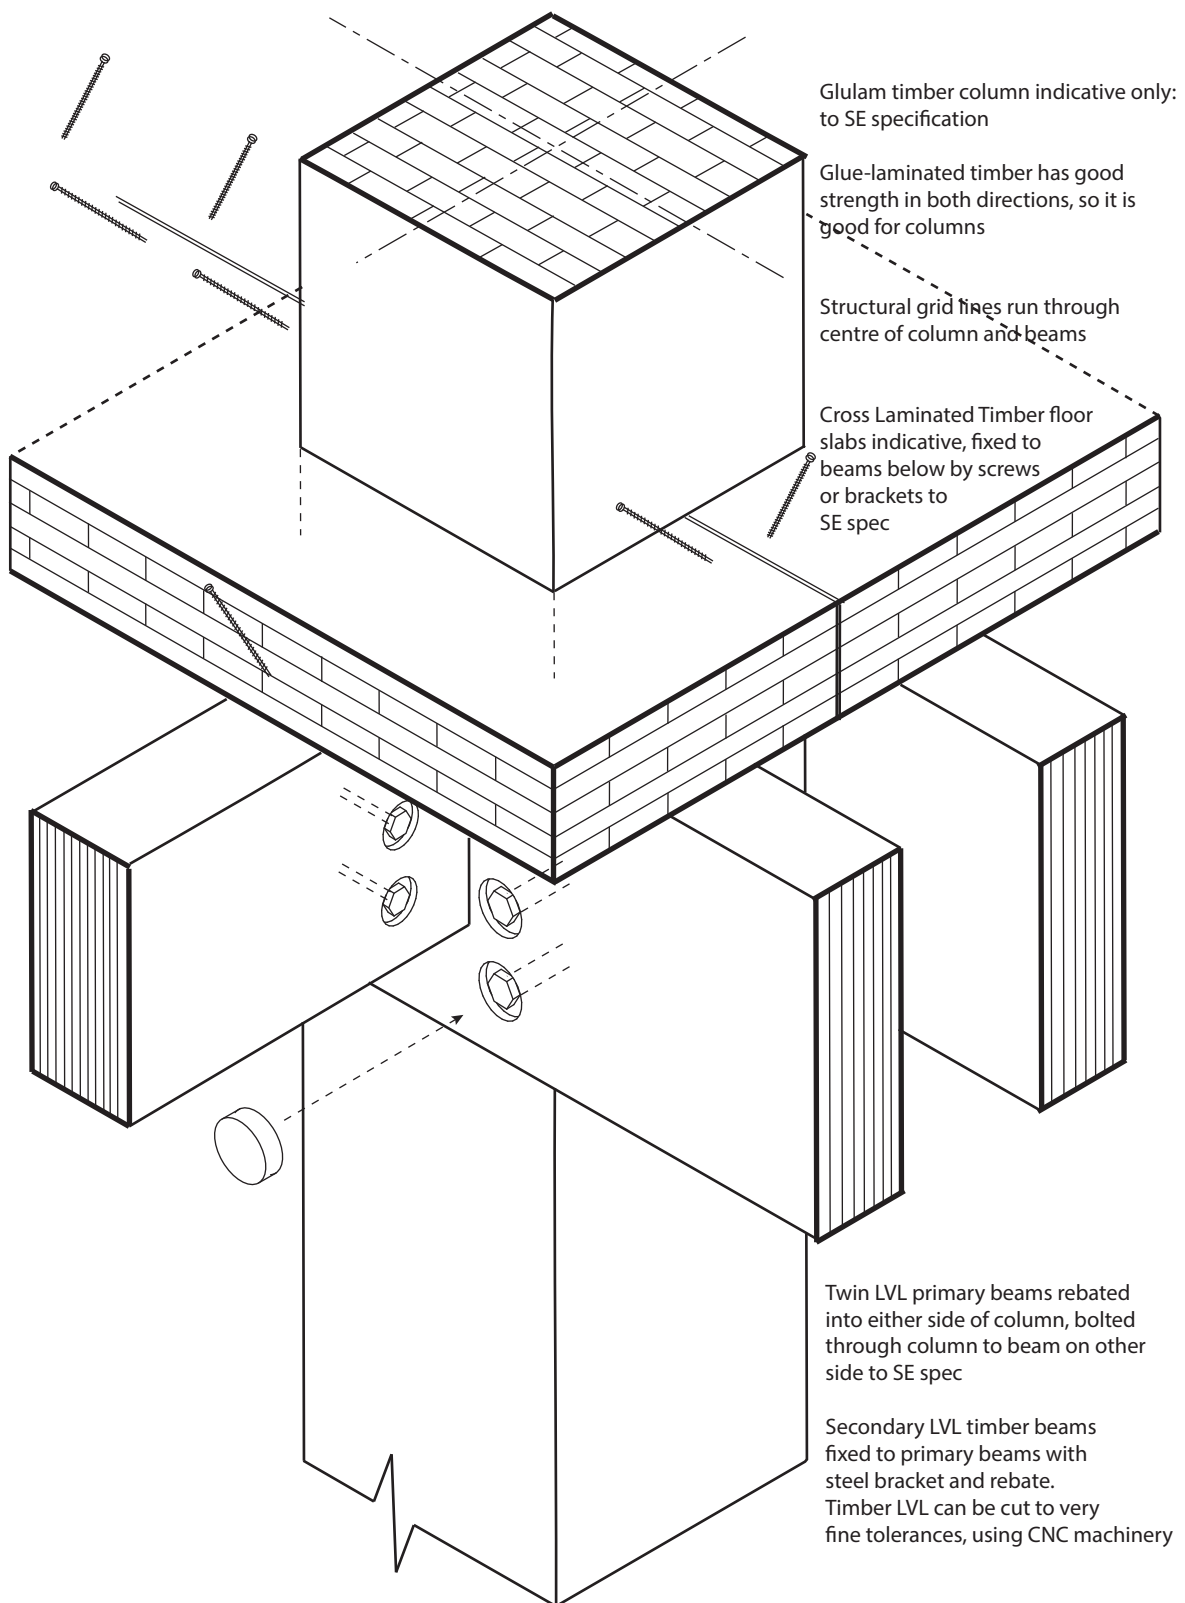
Typical engineered timber column/beam/slab junction (with CLT slab)
